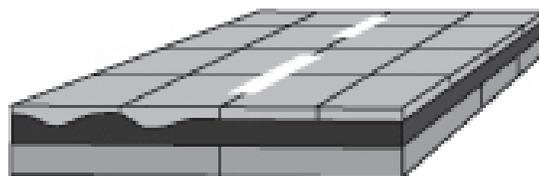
Illustration. Bonded concrete overlay over composite pavement.
